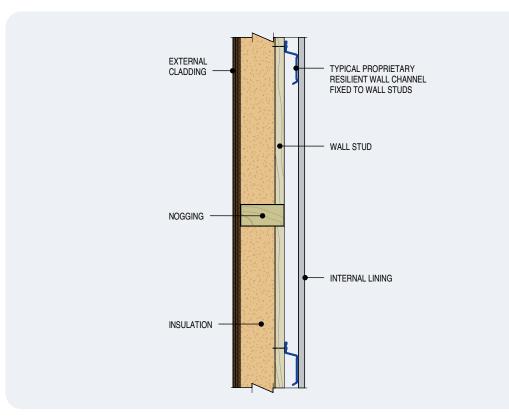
Resilient mounted wall cladding. Vertical section through wall
